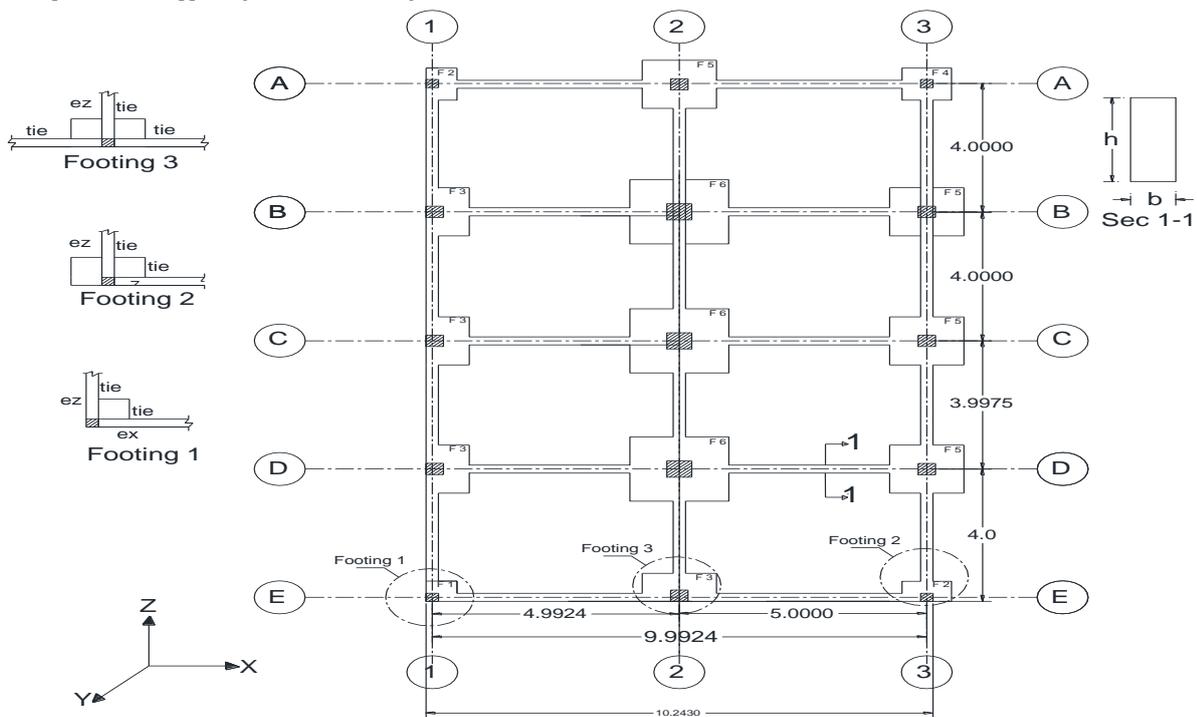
plan of tie beam dimension connecting isolated footings under eccentric loading.
